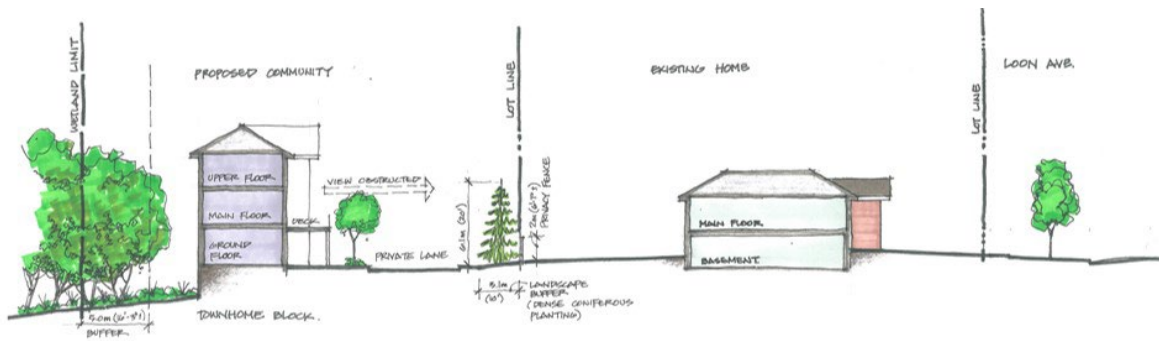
Concept cross section of traditional cluster townhouse units and existing dwellings along Loon Avenue.
